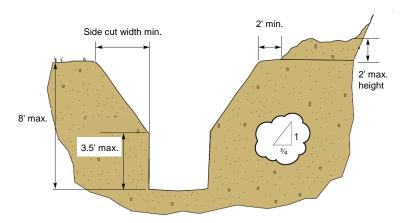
Sloped excavation with unsupported vertical lower walls, maximum depth 8'
